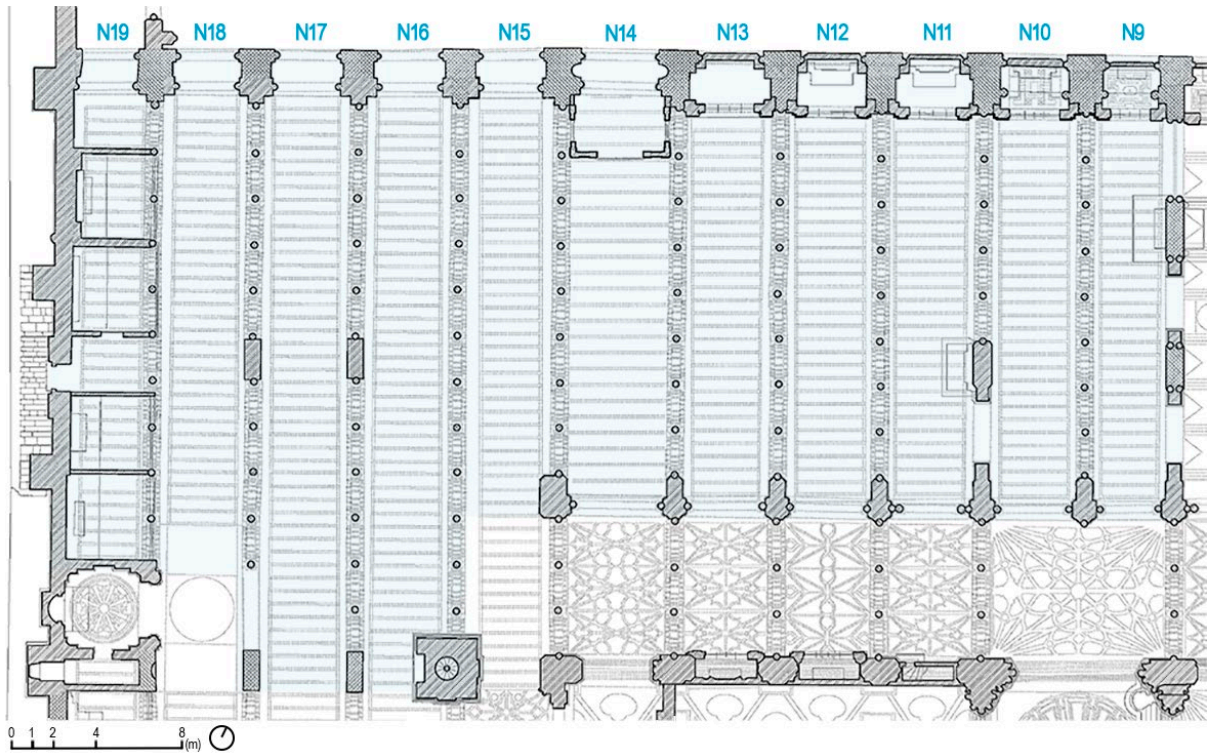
Plan view of the Abd 'al-Rahman I sector (naming the naves in light blue, N_i).
